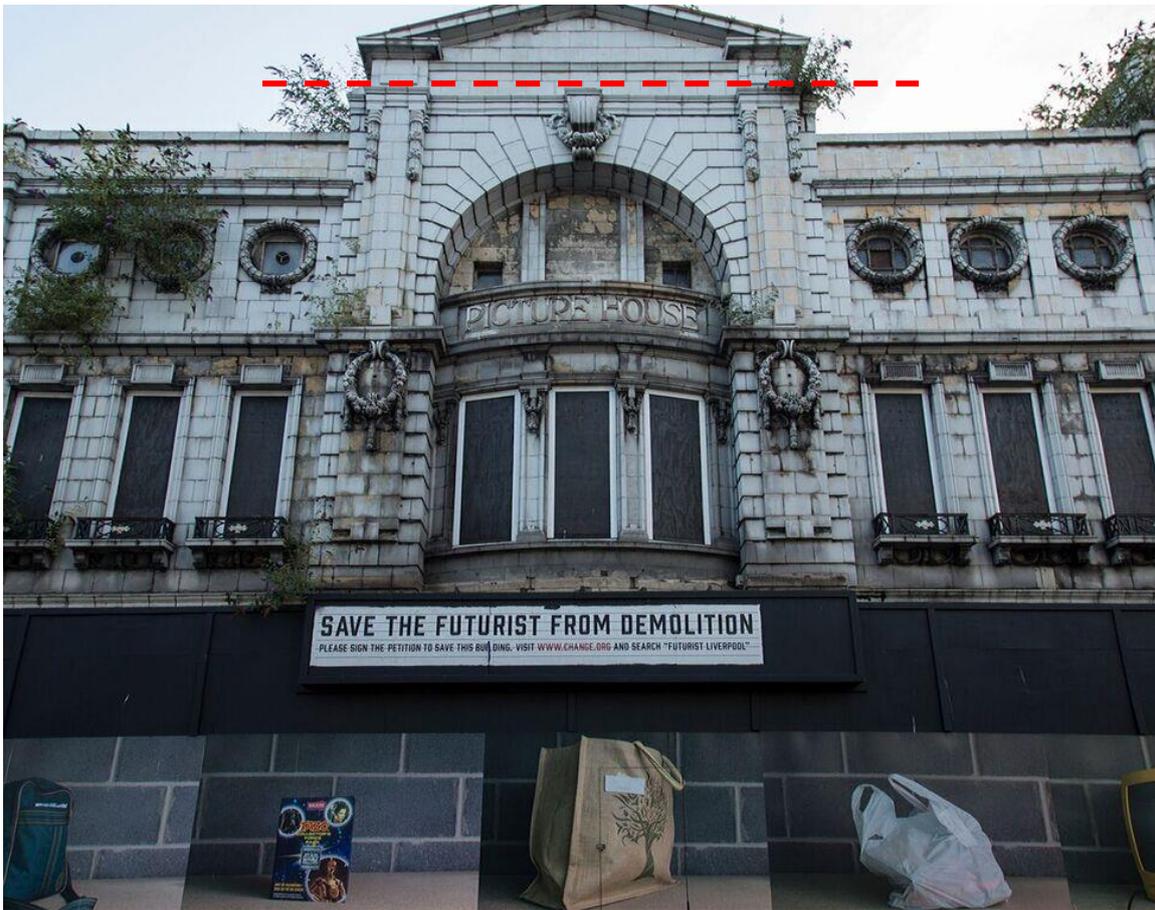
Steel beam to front elevation with no evidence of corrosion jacking to built-in end
